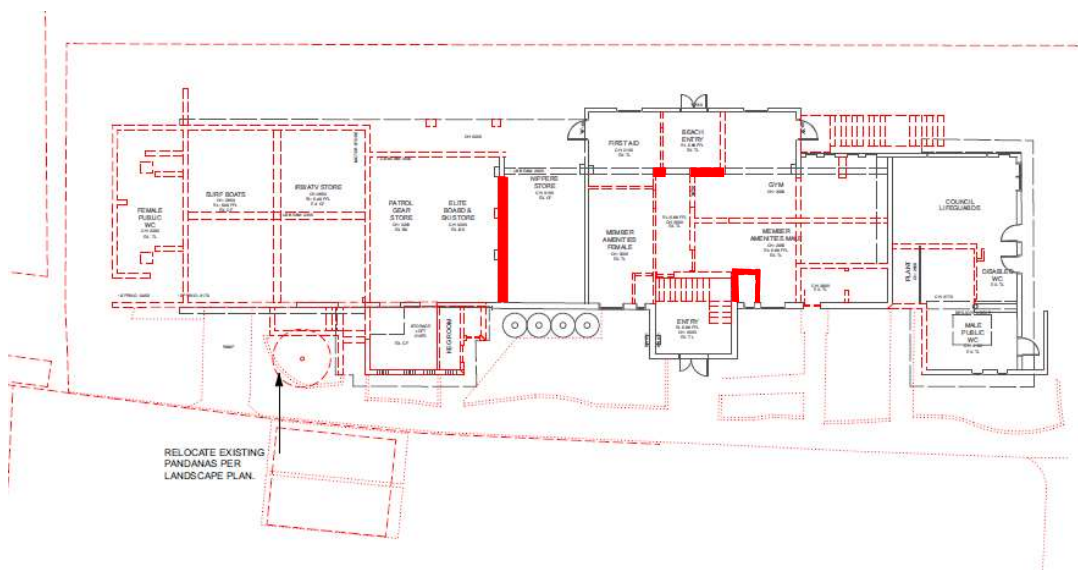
Ground Floor demolition plan. Fabric proposed to be demolished graded as being of High significance shaded red. Note that none of these elements impact the external appreciation of the Mediterranean aesthetics of the retained portion of the building. (based on Fig. 115 of the CMP) (Source: Adriano Pupilli Architect, significant fabric overlay NBRS)
